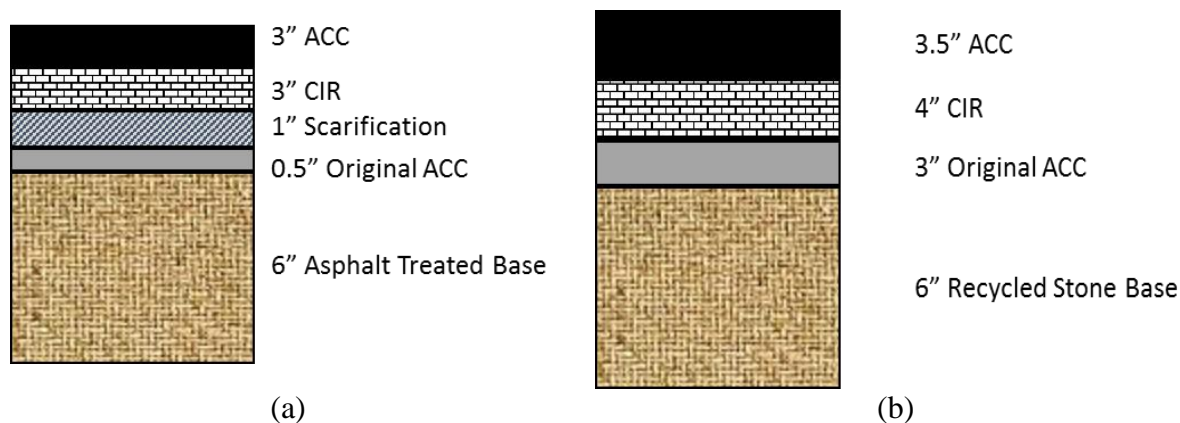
Typical cross sections for the (a) O'Brien County pavement and (b) Story County pavement
